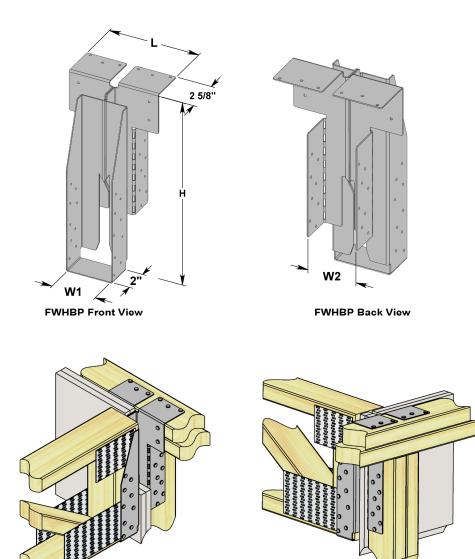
FWH TOP MOUNT FIRE WALL HANGER AND TYPICAL INSTALLATIONS ON STUD WALL AND SOLID SAWN HEADER
